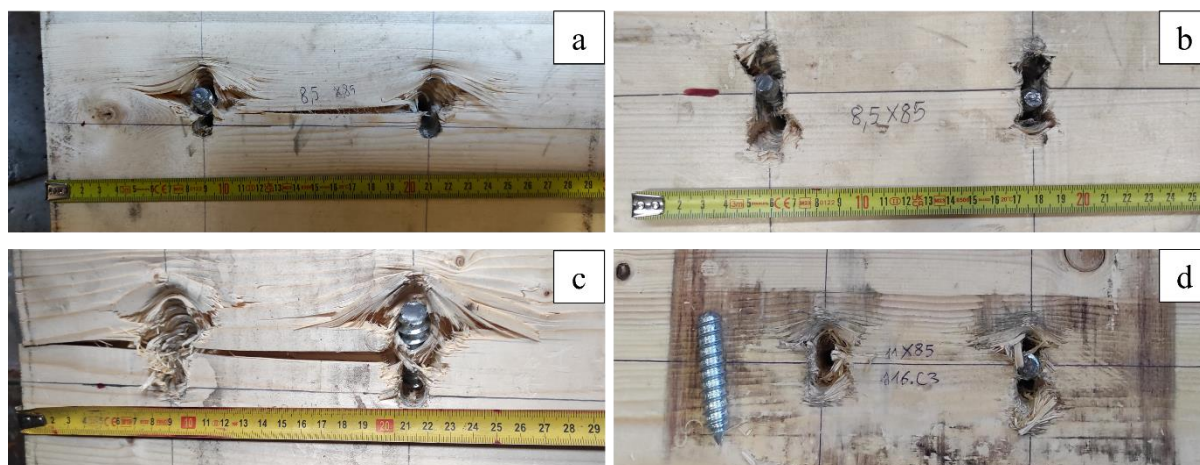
CLT panels in the surroundings of screw holes after testing. Specimen with 12 mm screw tested in static loading conditions (a); specimen with 12 mm screw tested in cyclic loading conditions (b); specimen with 16 mm screw tested in static loading conditions (c); specimen with 16 mm screw tested in cyclic loading conditions (d).
